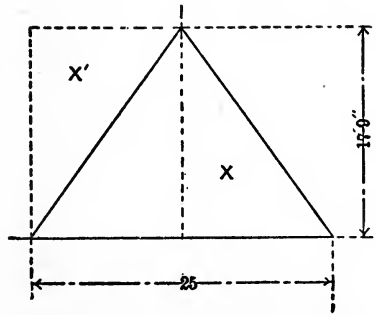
DEVELOPED PLAN OF REAR SECTION OF ROOF E
